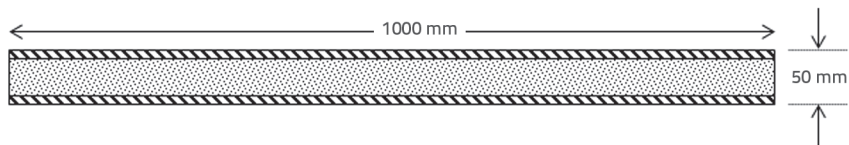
Sketch of the width of the composite panel showing the two steel plates and the concrete core (not to scale, shear studs not shown)
